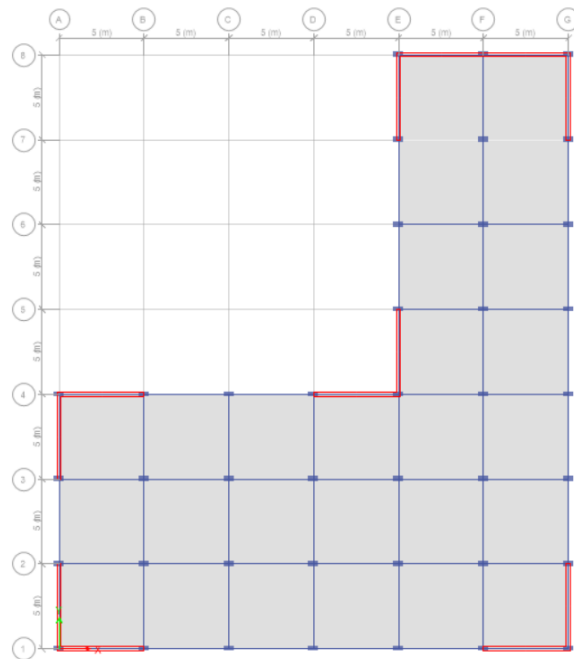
UNSYMMETRICAL BUILDING WITH GRP SHEAR WALL
